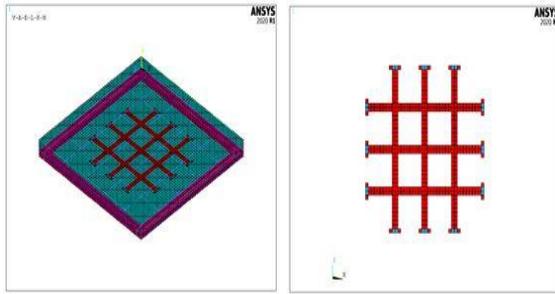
Reinforcement's distribution and CFRP layout of model SC2-S1
